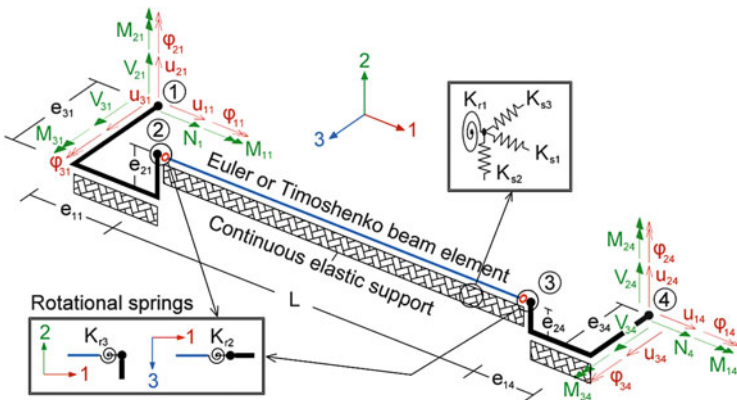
Generalized beam finite element on continuous elastic (Winkler) foundation with 3D rigid offsets for modelling eccentric column-foundation beam connections
